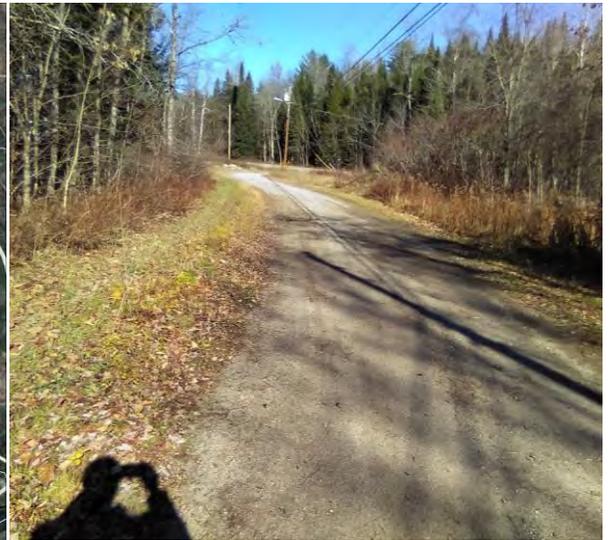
Segment 22134 has very little crown and no ditches, causing water to run along the road surface picking up sediment.
